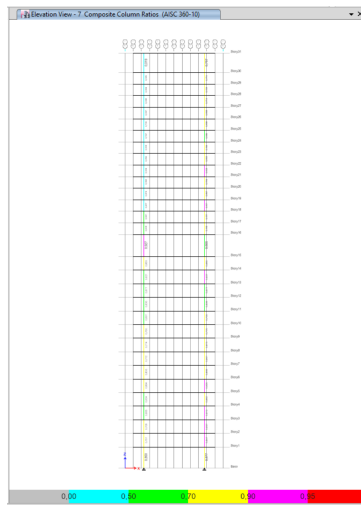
Utilization degree for composite columns in elevation 7 due to ULS wind loads
